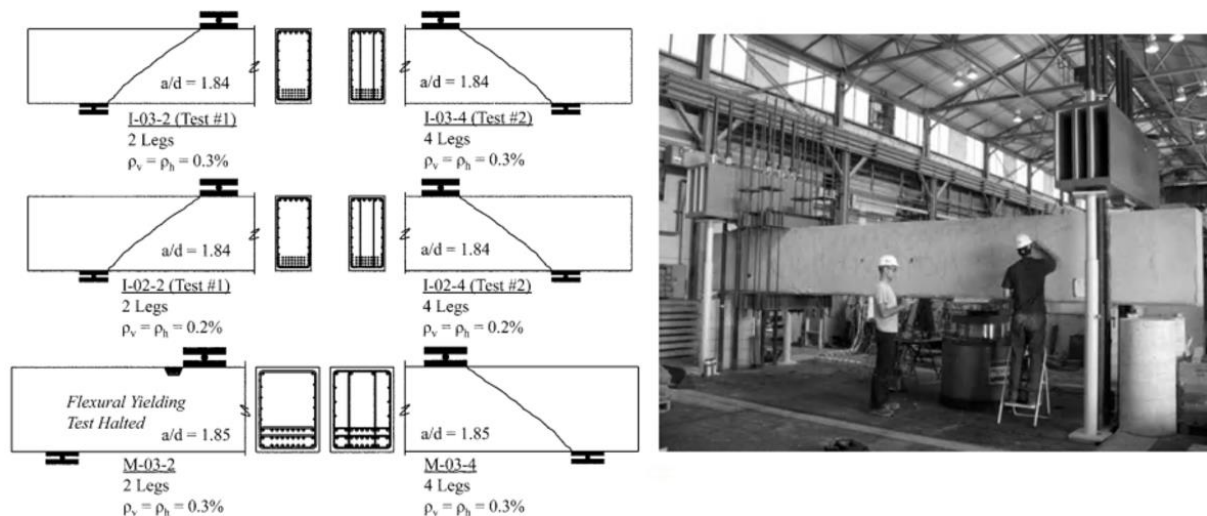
Deep beam specimen layouts and test frame (from Tuchscherer et al. 2011)
